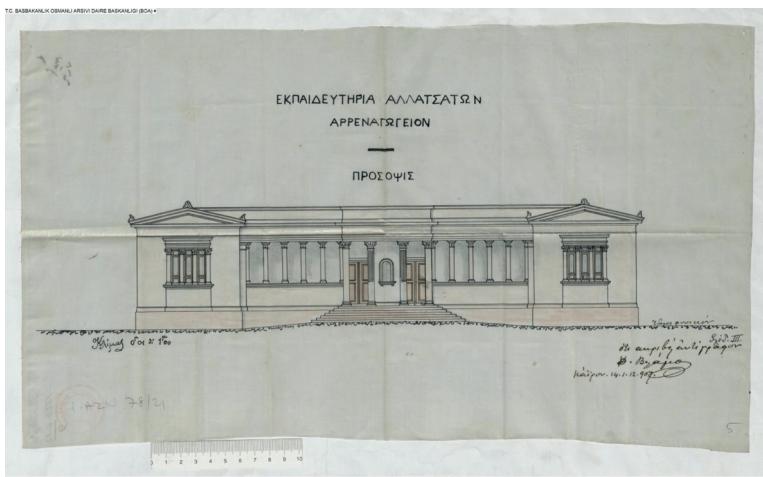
Elevation Drawing of the Greek Boys' School in Alaçatı
